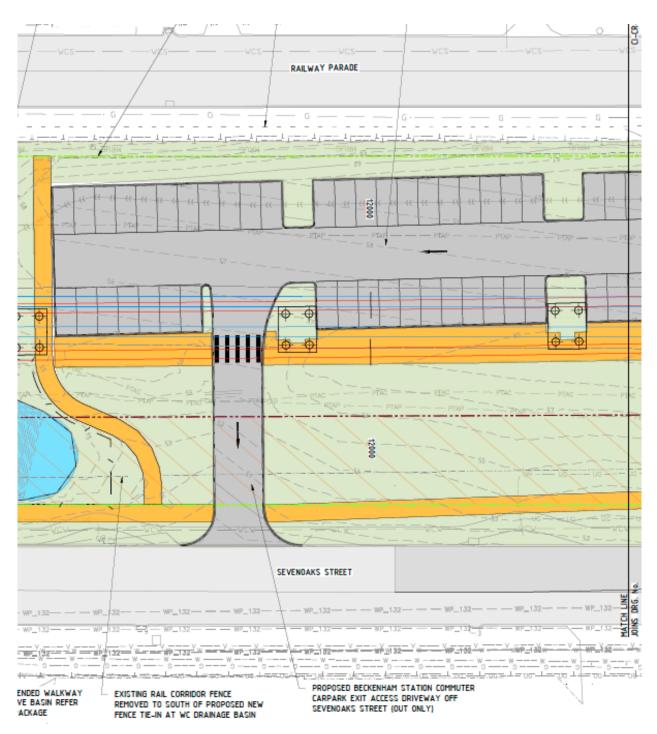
Proposed Beckenham Train Station Park 'n' Ride Parking Facilities (Left Side)
